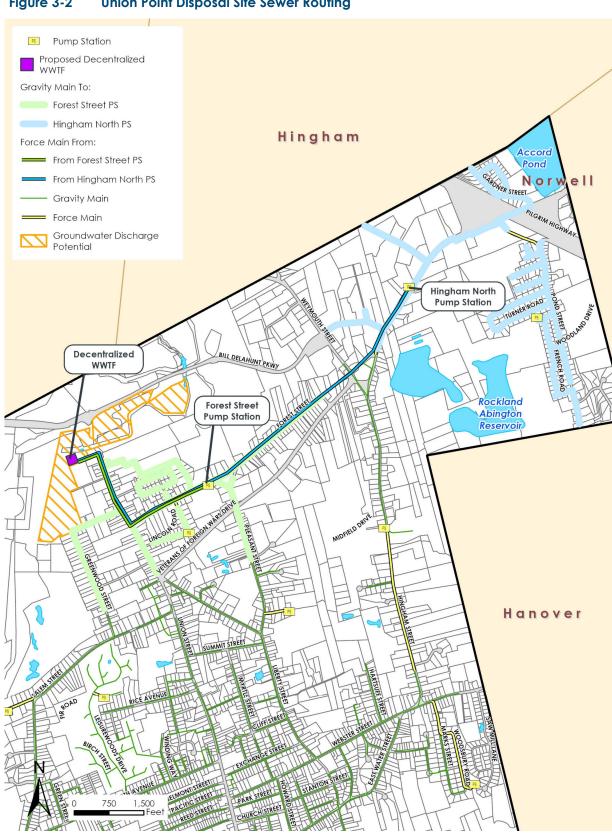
Union Point Disposal Site Sewer Routing
